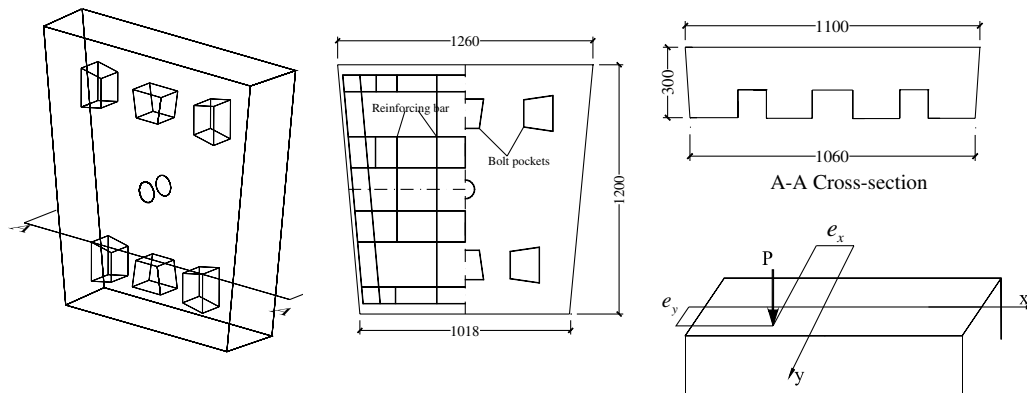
Configuration and reinforcing bar and bolt pockets arrangement of segment (all dimensions are in mm).
